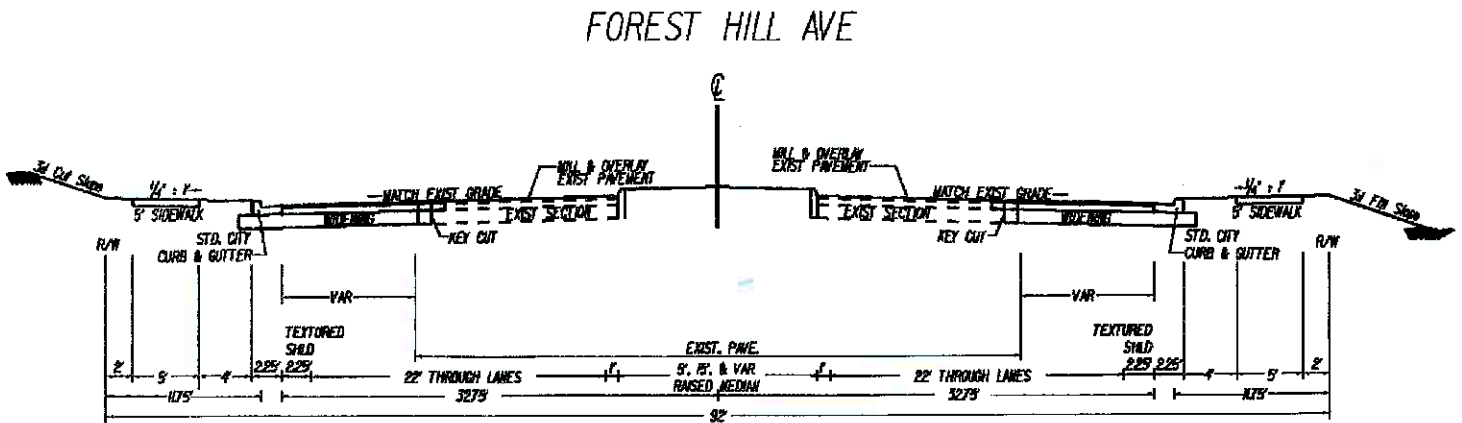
Proposed Forest Hill Avenue Typical Section
